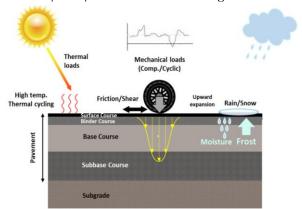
Some drivers responsible for asphalt pavement distress [256]
